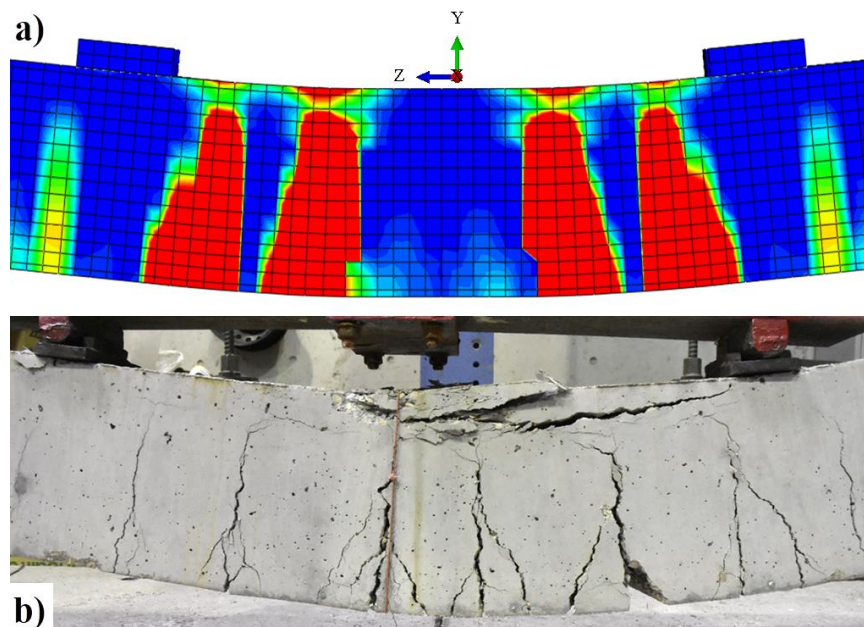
(a) Numerical (b) and experimental cracking along the cross-section of the unstrengthened RC beam (specimen RC_AT) at the failure instant: mid-span detail view
